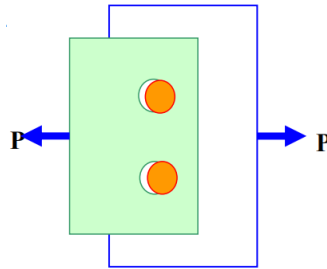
Failure of a rivet by crushing. Source: NPTEL, 2018.
